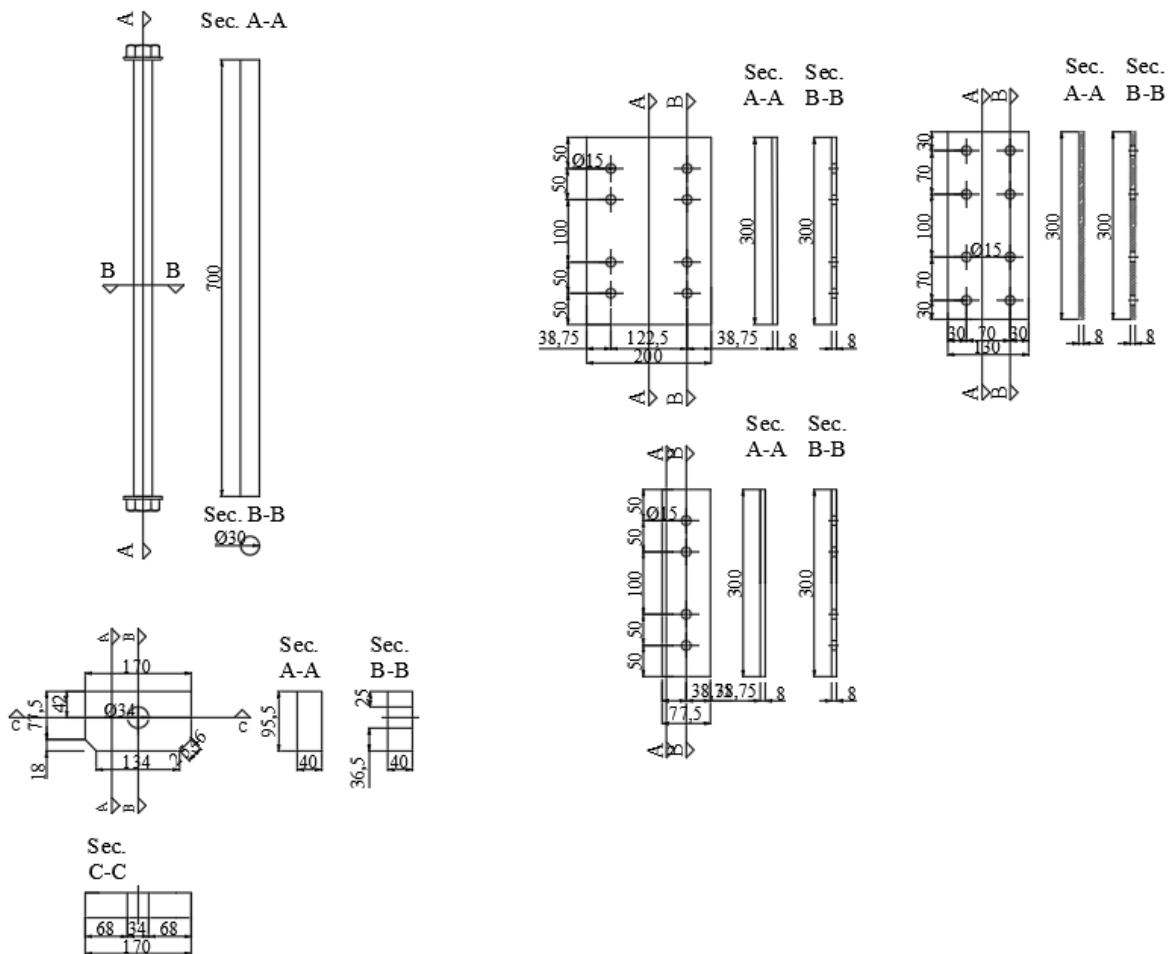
Single components and plates of the SC-CB (dimensions in mm)
